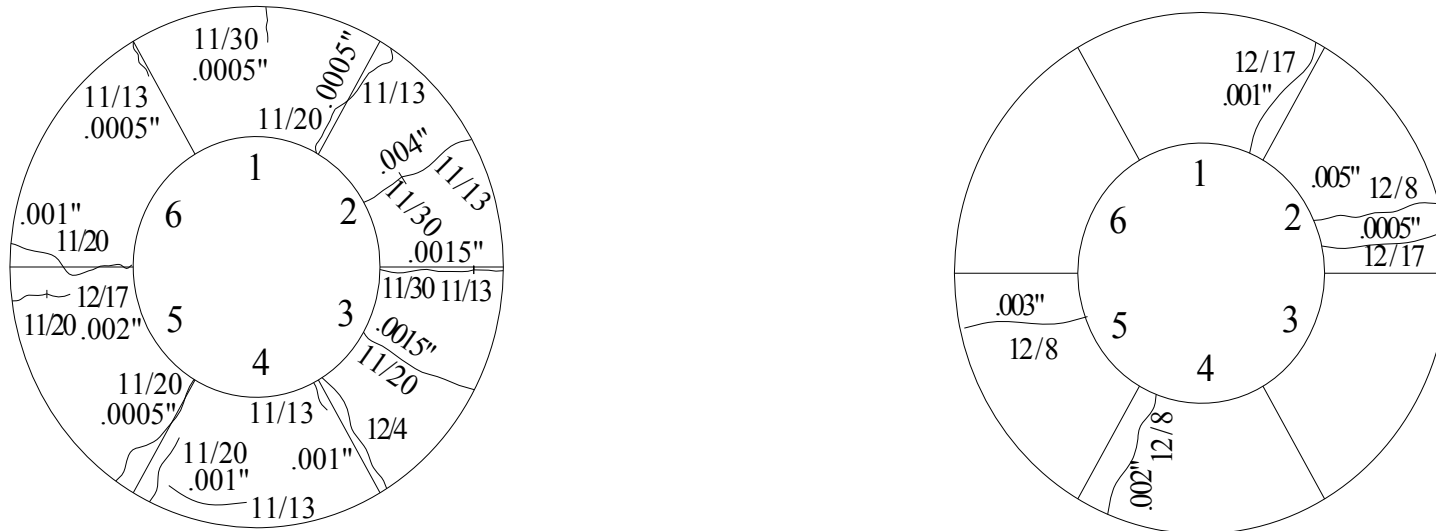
G1-M3 Crack Drawings for Ring Specimen 2, Side View (Top Figure) and Top-Bottom Views (Bottom Figure)
